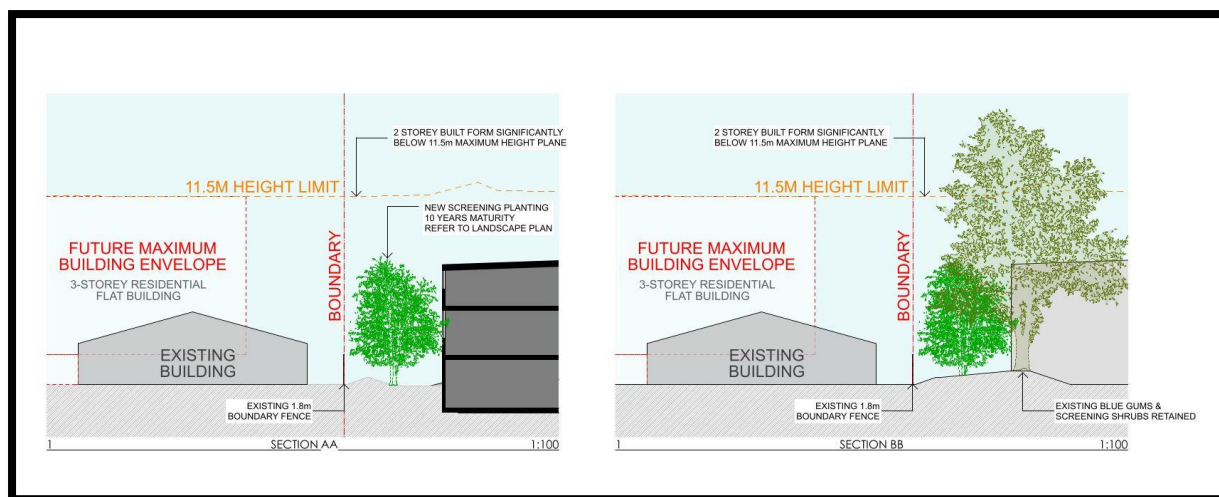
Cross section between proposed built form and residential flat buildings in Zone A
